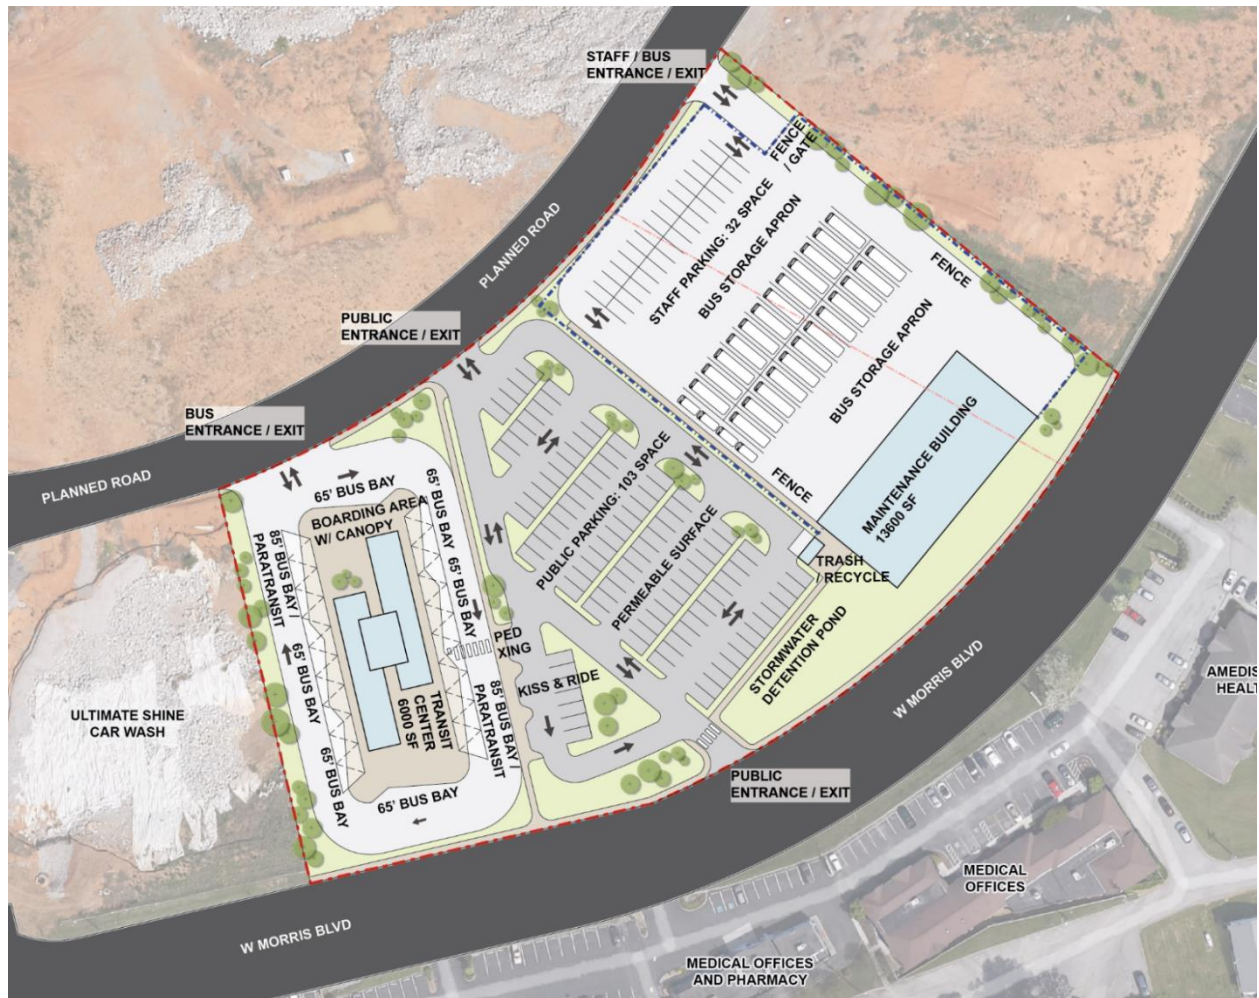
Visualization of Proposed Lakeway Facility at Verde Crossing (Site 9)
